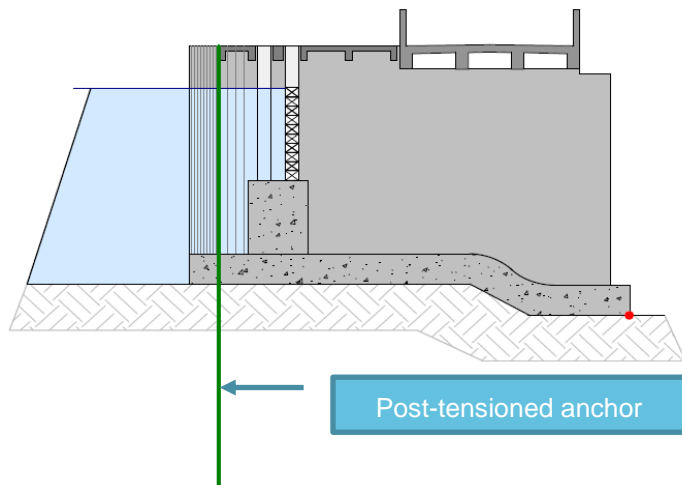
Recommended Remedial Work at Main Dam - Post-Tensioned Anchor in the Pier
